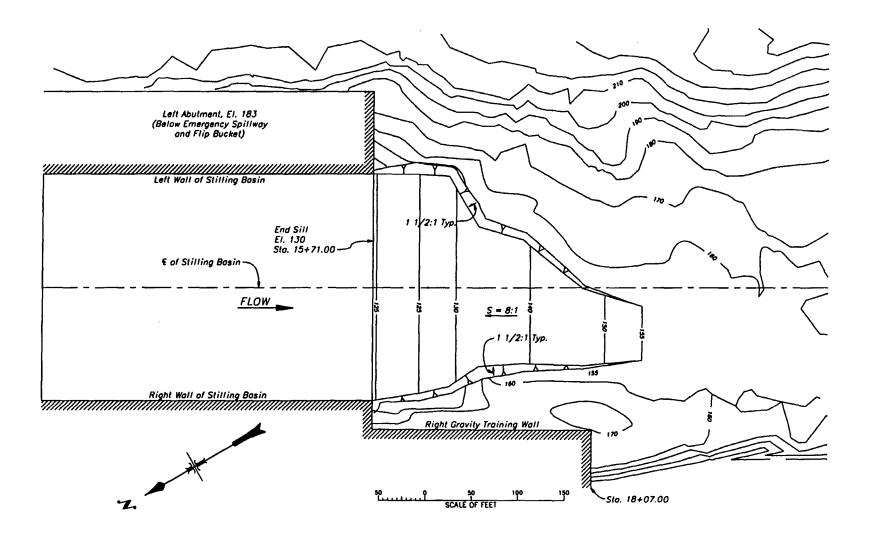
Plan view of stilling basin and exit channel topography after excavation.
